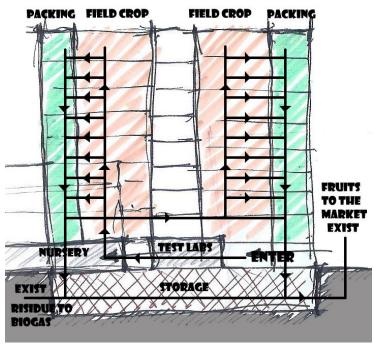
Section showing plant journey in the proposed model of vertical farm building
